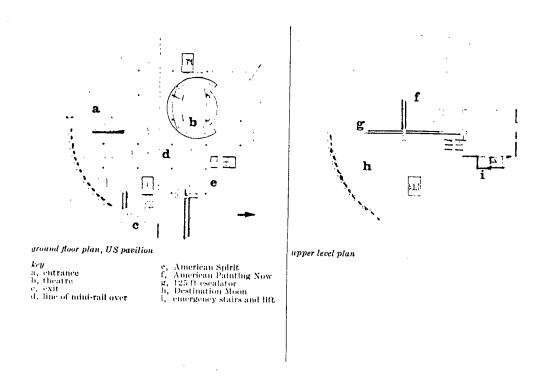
Ground Floor Plan, American Pavilion, Expo 67
